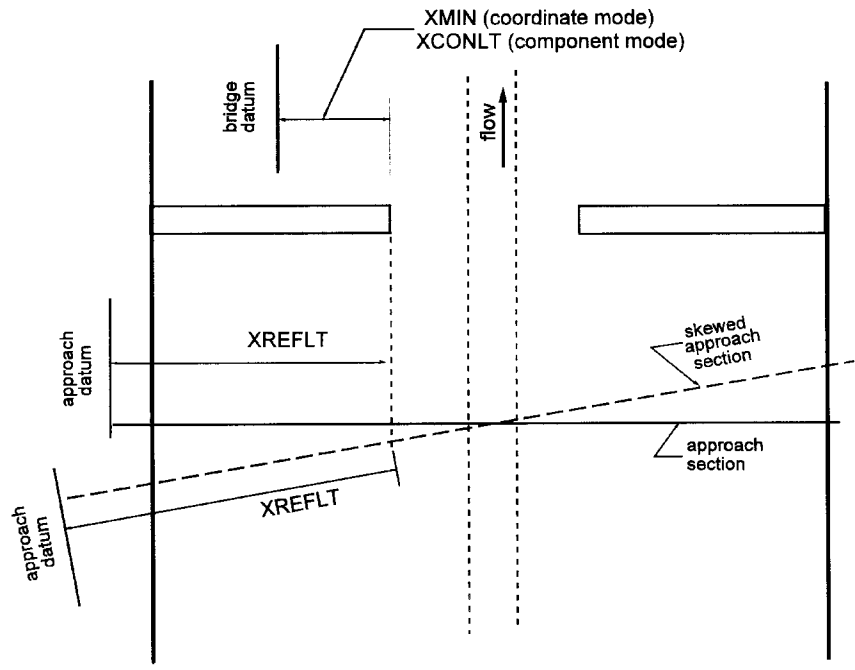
Datum correction between bridge opening and approach sections.
